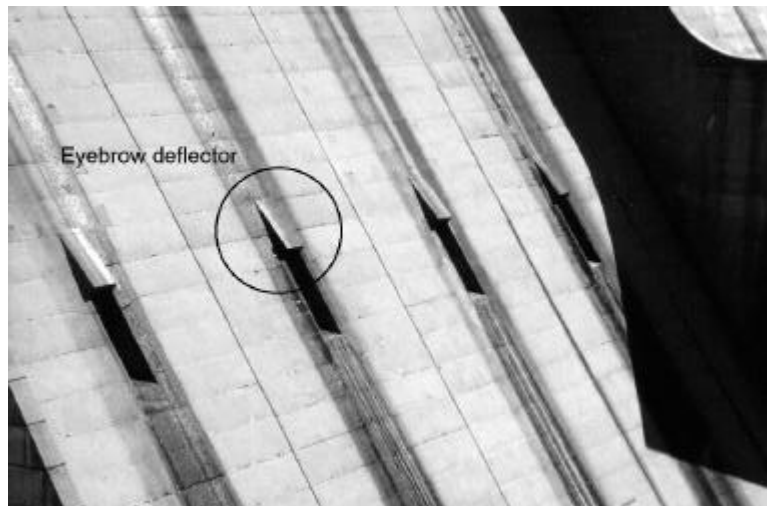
Eyebrow deflector installed above an outlet exit on the Folsom spillway.
